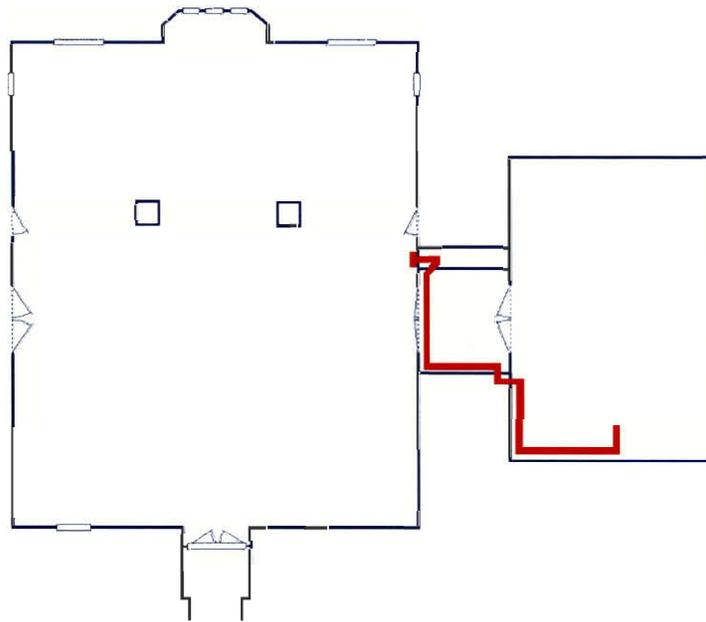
Cabling Route from the Control Room to Spaulding
